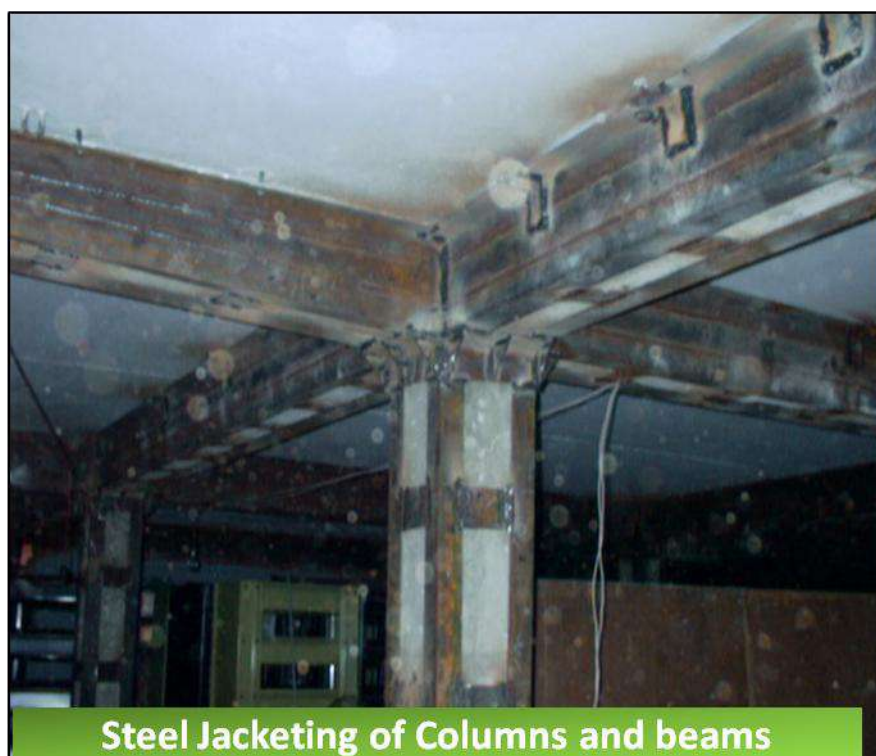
Steel jacking of columns and beams (source: MRB & Associates)
